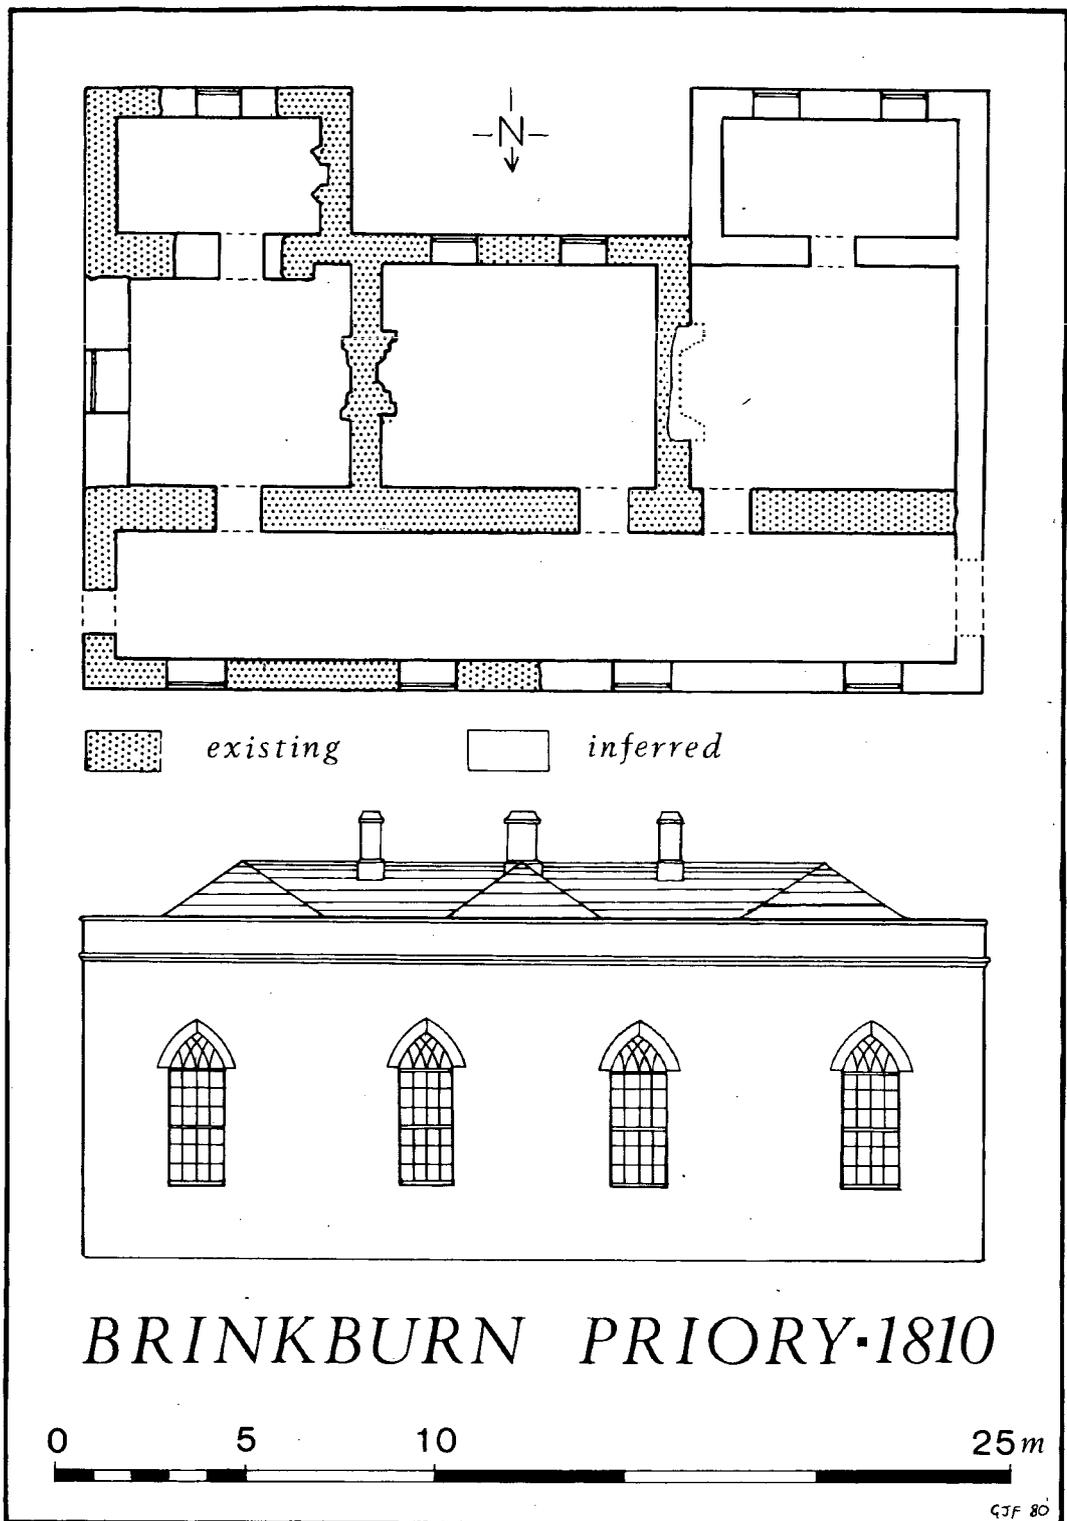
Brinkburn Priory: Reconstruction of Richard Hodgson's house, 1810. Plan and north elevation, Scale 1:200.
